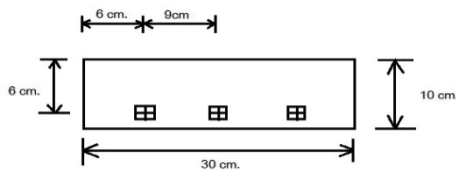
Cross section of concrete slab reinforced grid and twisted bamboo
